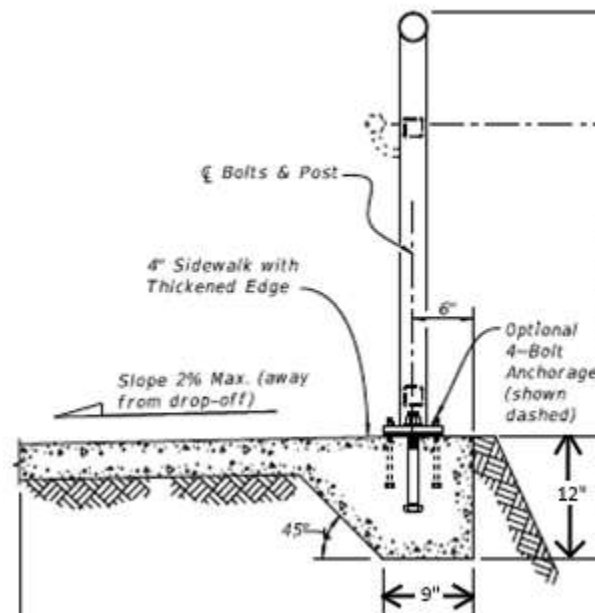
Typical section on concrete sidewalks from Design Standard Index 852 sheet 8 of 8 (FDOT, FY2016-2017)
